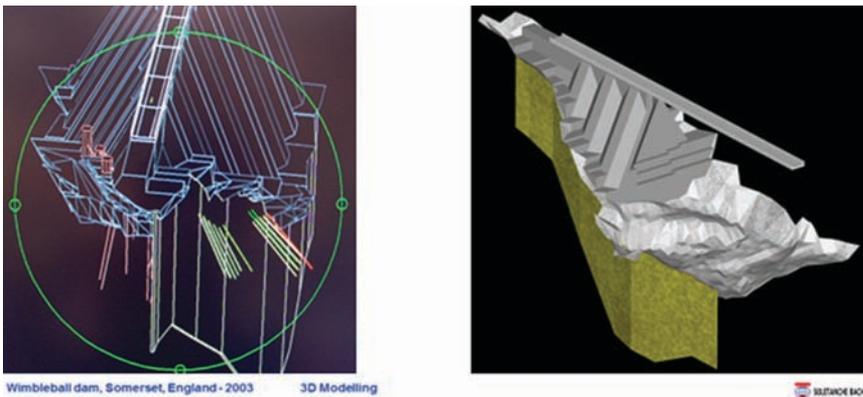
3D model of Wimbleball Dam foundation based on historic records.
